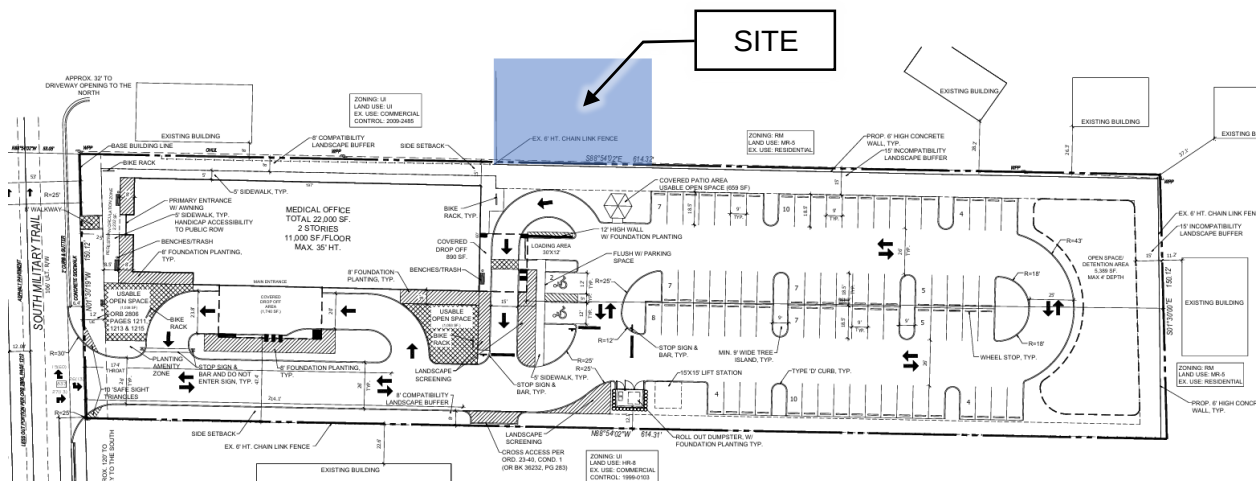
Approved Site Plan for Cacigas Medical (1248 S. Military Trail)
